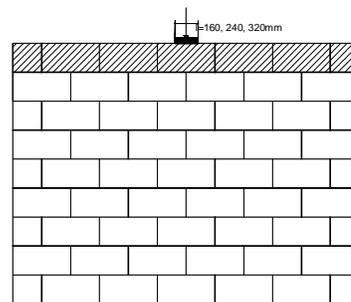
One-course bond-beamed hollow concrete masonry wall
